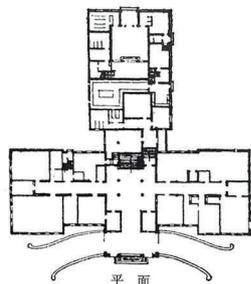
Ground floor plan and outlook of the office building Fig. 2-7 Symbolic decoration on the eave
